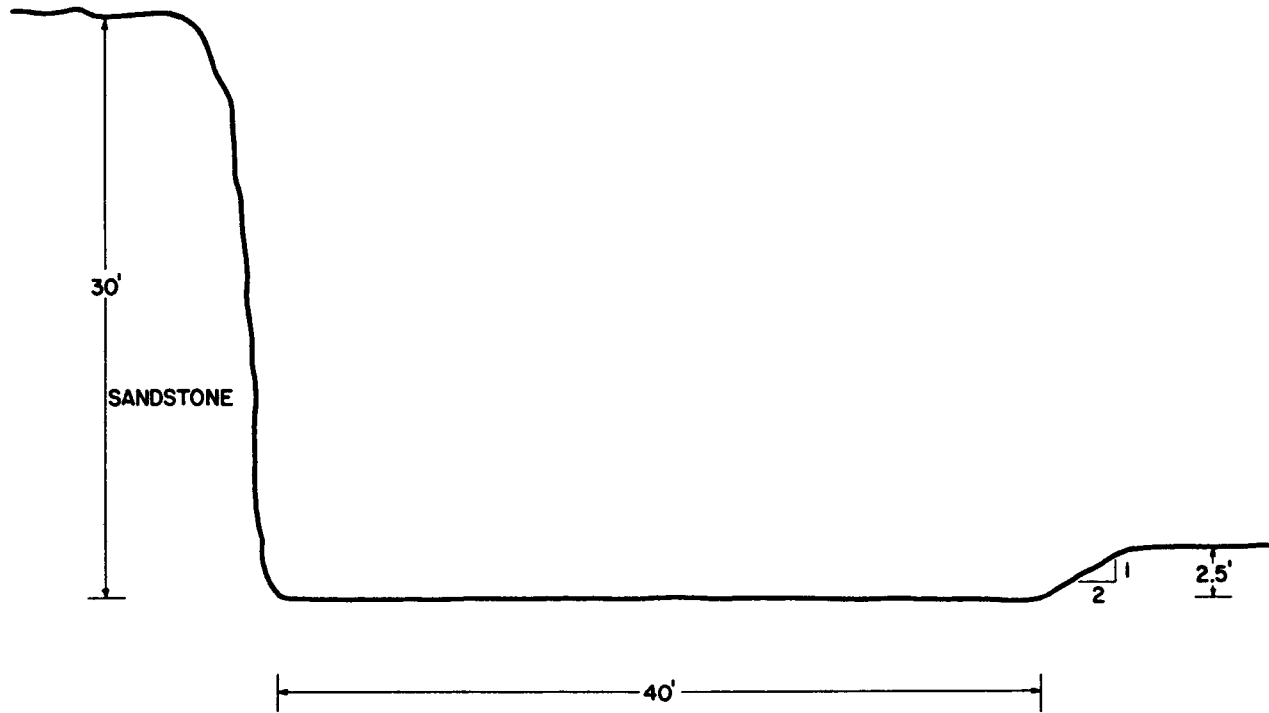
Cross section of North Battle Creek at point of intersection with diversion channel.
